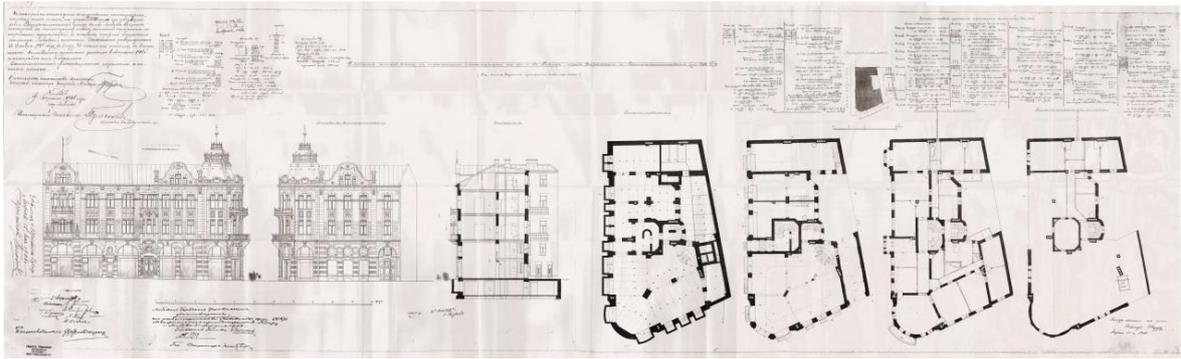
Construction design of the trading and apartment house at Graudu iela 44. 1908
